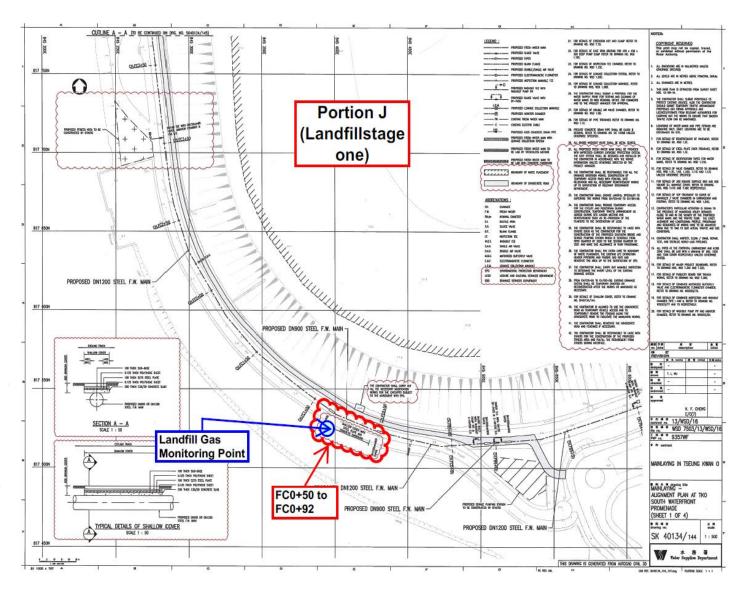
Location Plan for Portion J – Landfill Stage 1 (FC0+50-FC0+92)
